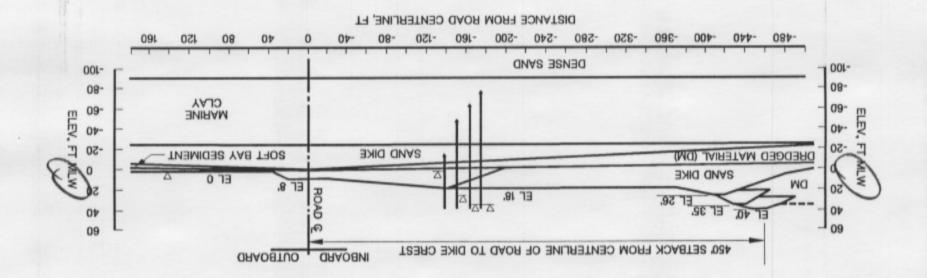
Generalized Cross-Section, Northwest Corner Perimeter Dike
